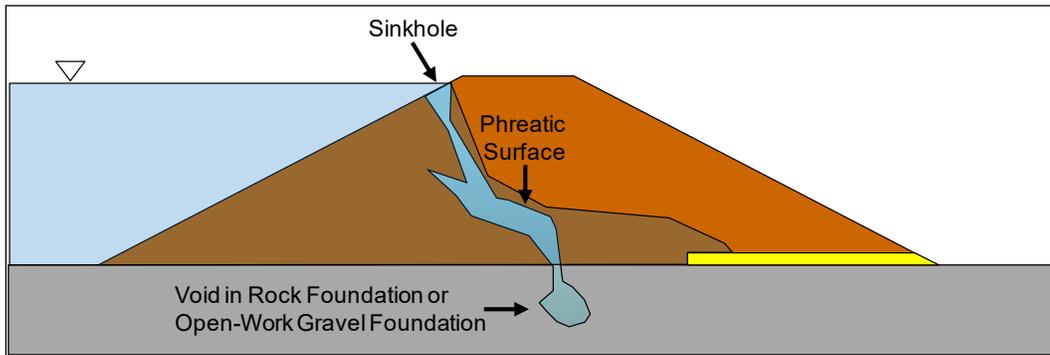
Internal erosion of the embankment into the foundation.
